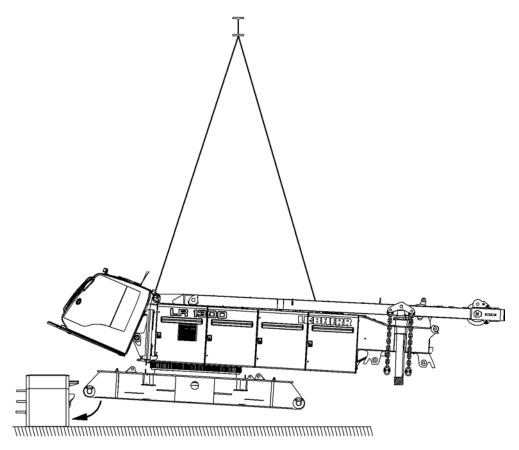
Unloading the machine and attaching the first crawler side frame without a self-assembly system
